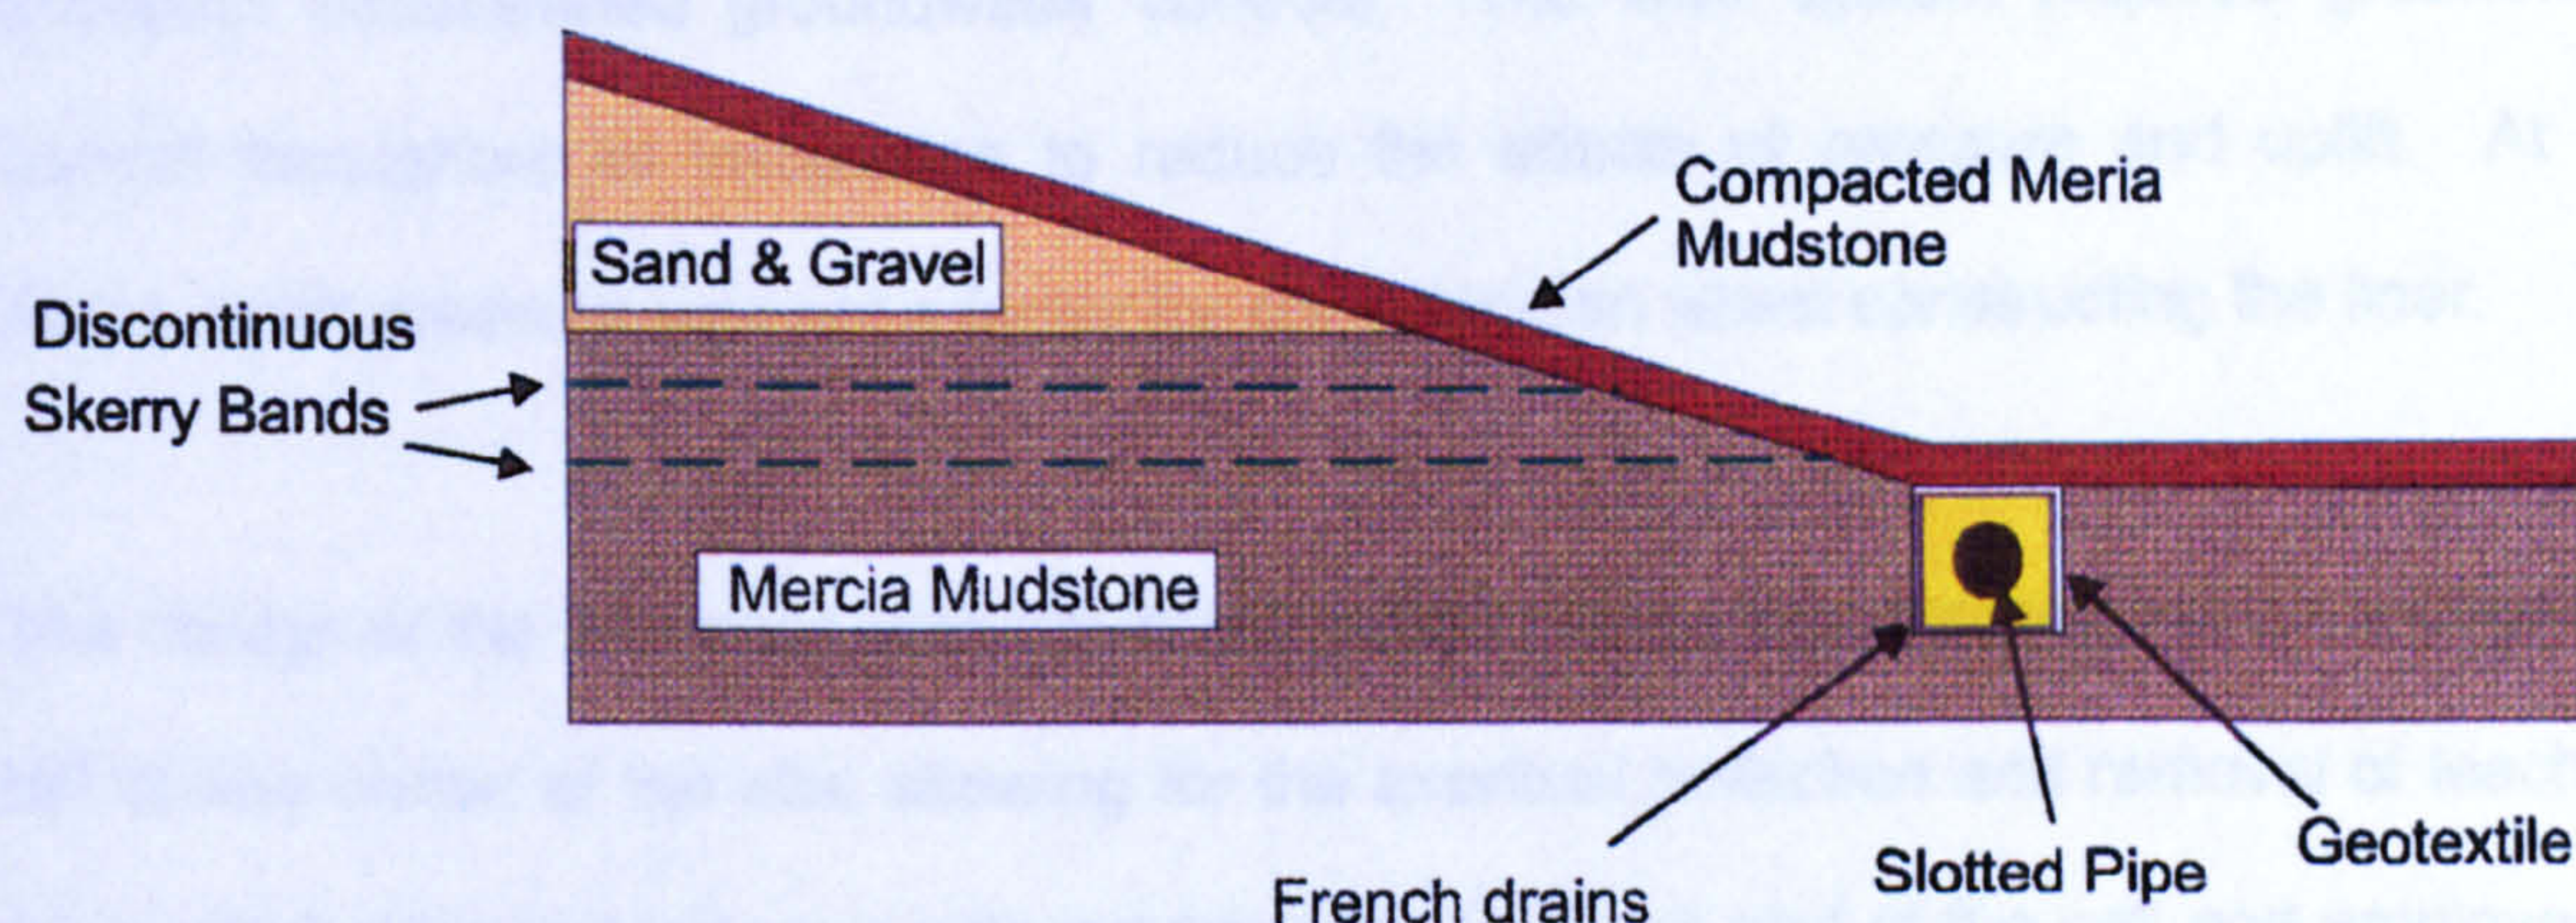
Schematic Diagram of the Groundwater Drainage System at Site Beta
